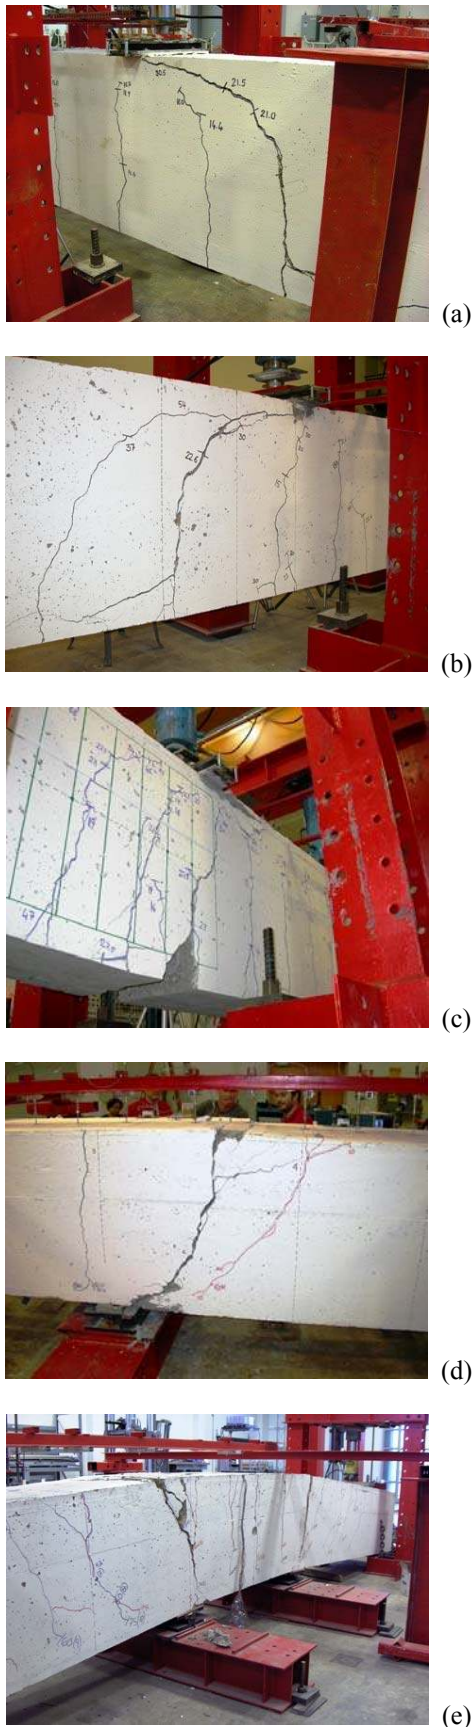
Photos of beam specimens after failure: 1 (a), 2 (b), 3A (c), 3B (d) and 4 (e).
